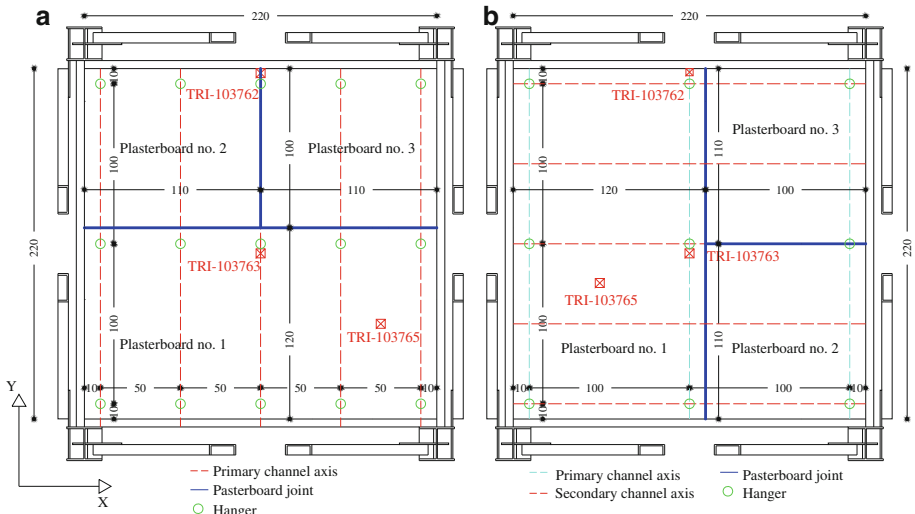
Triaxial accelerometers, plasterboard and hanger position in the case of single frame ceiling (a) and double frame ceiling (b) specimen
